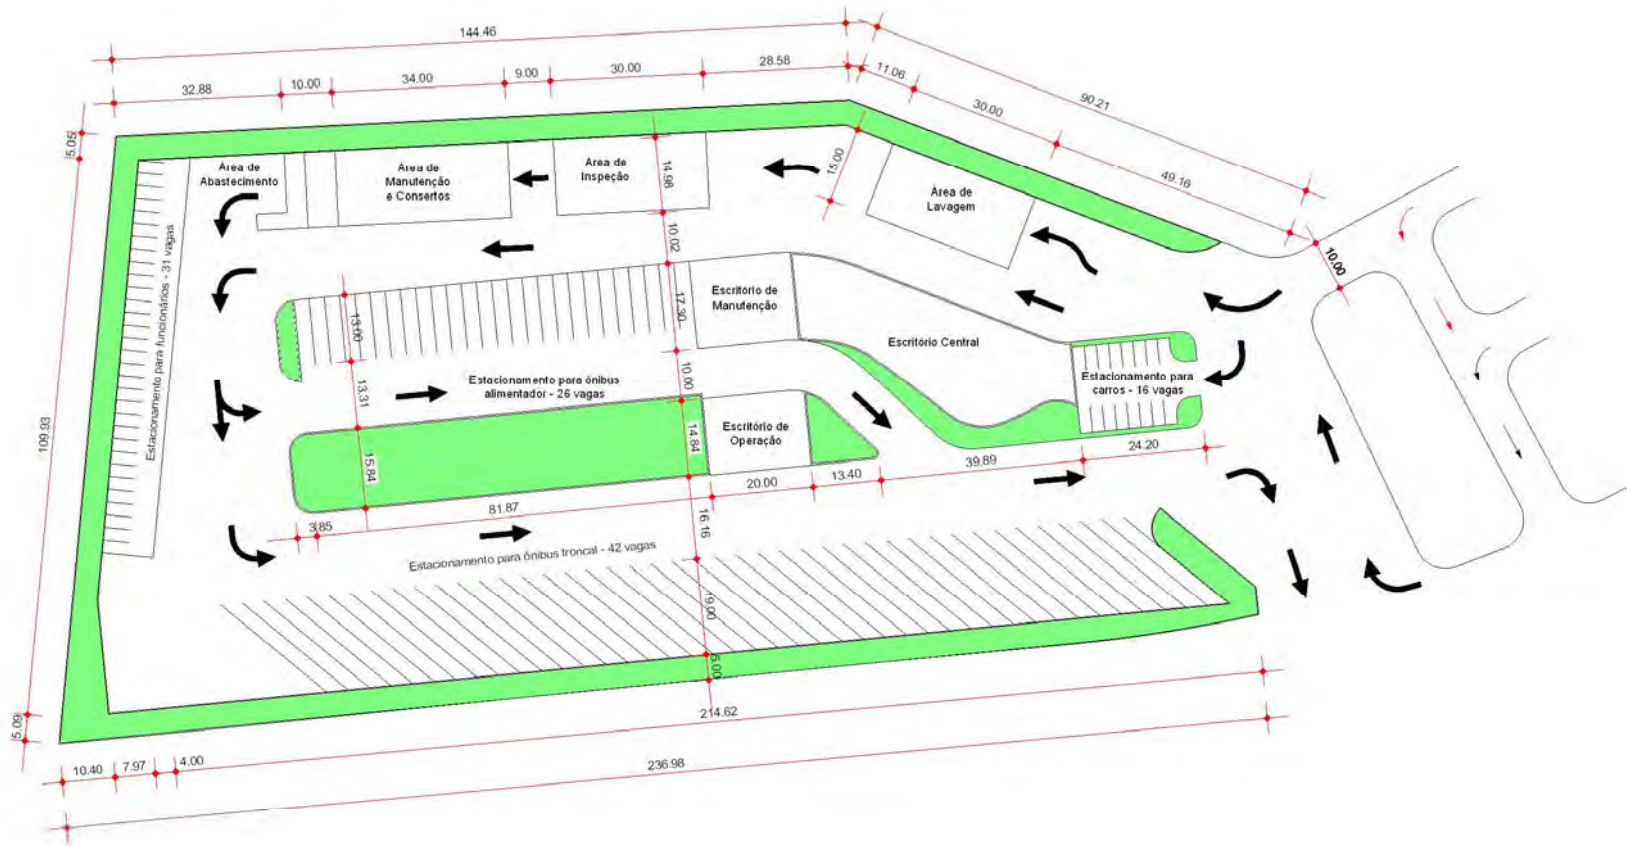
Floor Plan of Coqueiro Bus Depot
